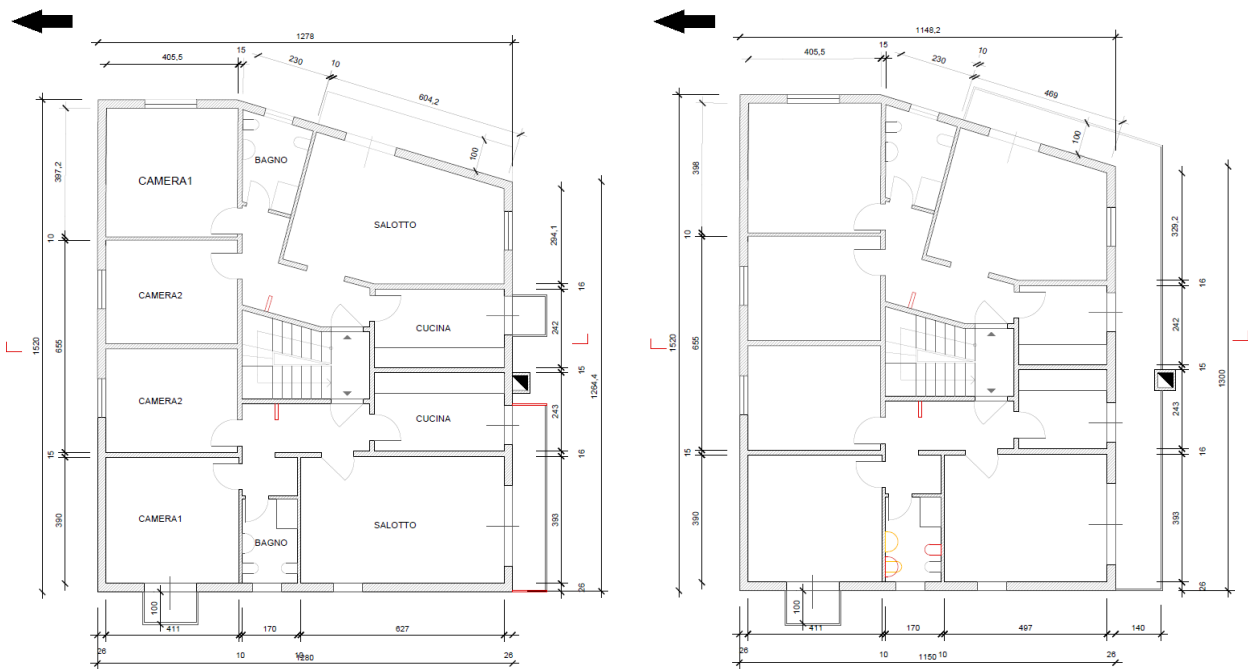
Planimetry floor by floor. First row of the table: garages on the left and first floor on the right.
